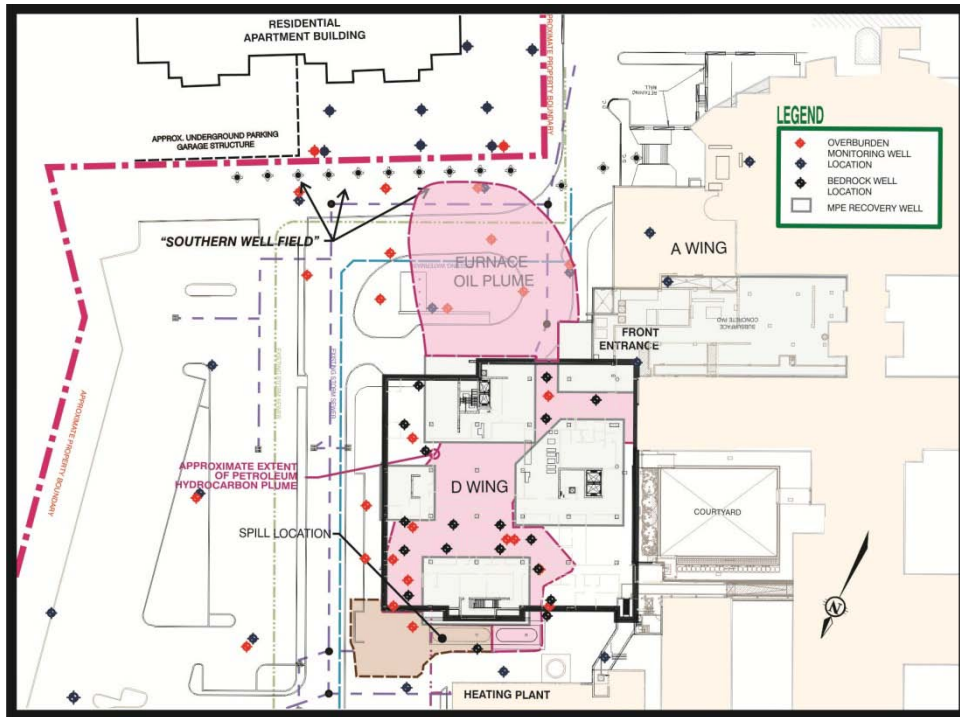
Site plan showing the extent of subsurface petroleum impact beneath D-Wing of hospital.
